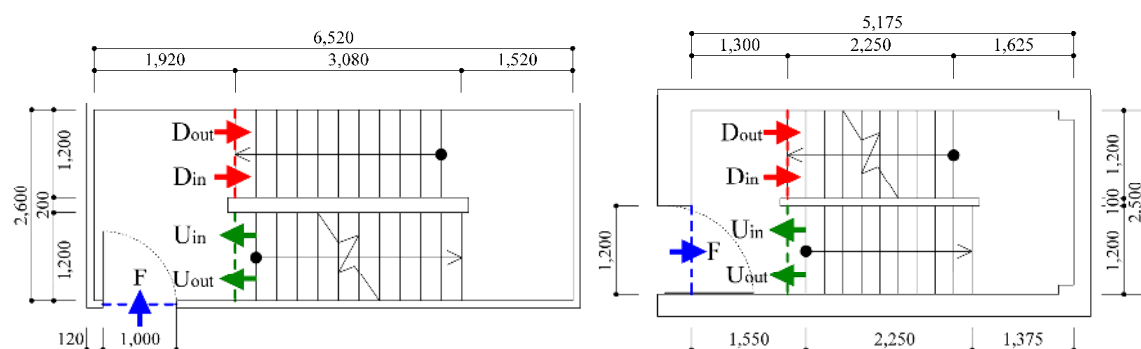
Floor plans of staircases in building A (Left) and building B (Right)
